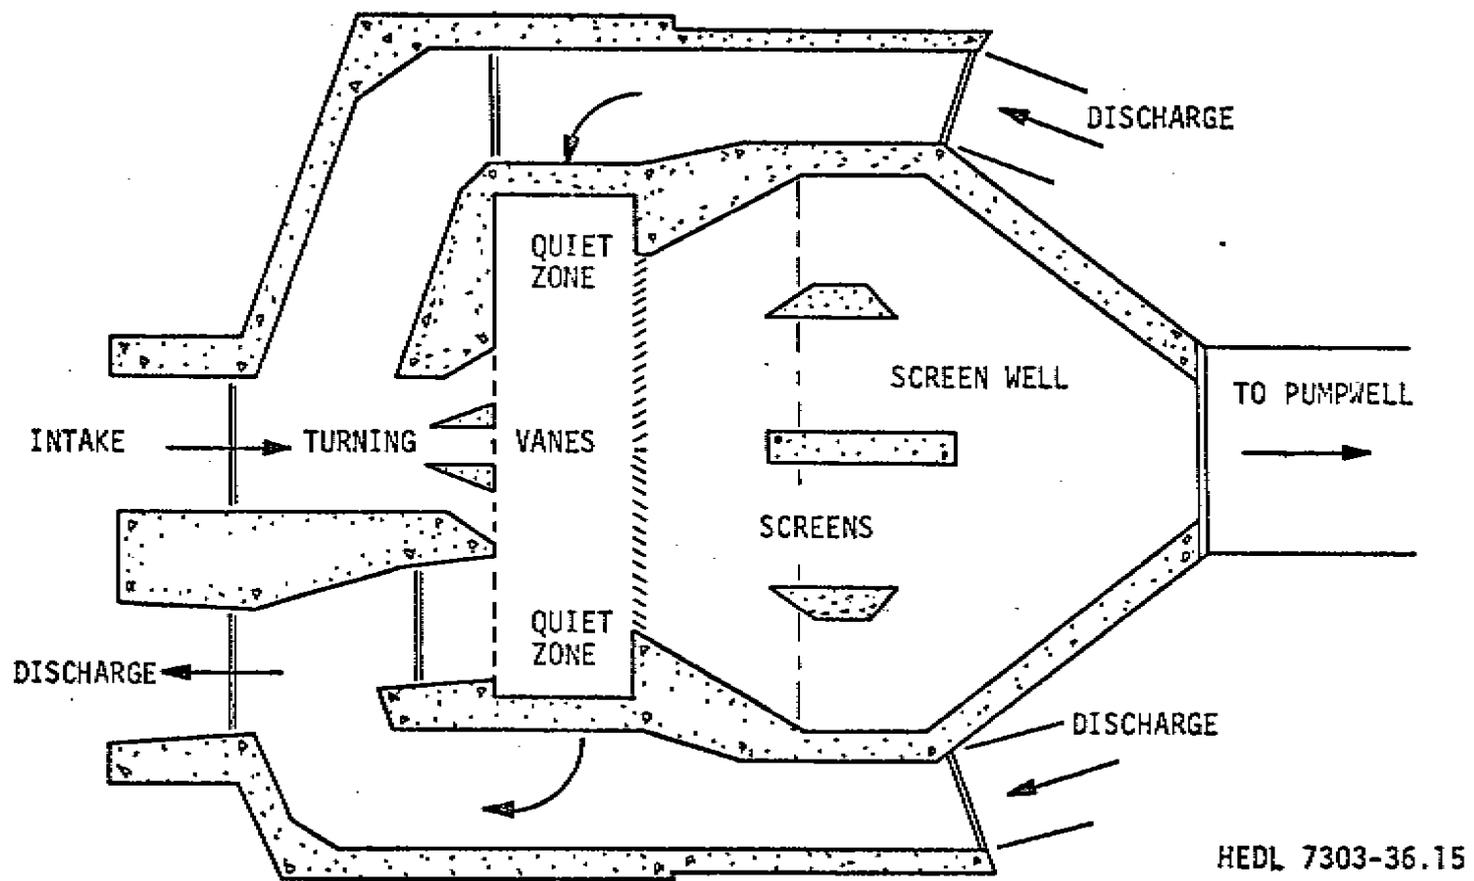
Plan View of Screenwell Used at Huntington Beach Steam Electric Plant.
